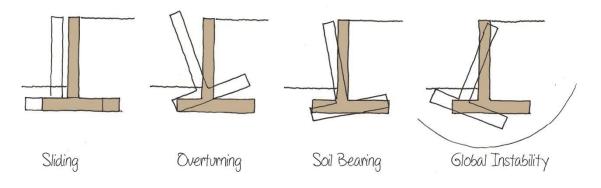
The classic modes of retaining wall failure also apply to weirs
